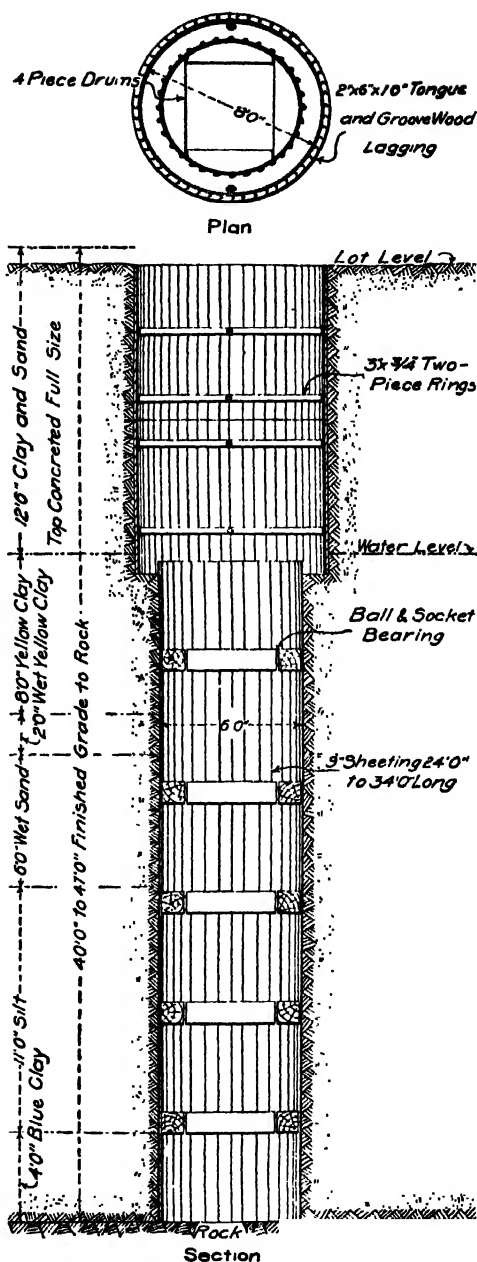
Open Well for Railway Exchange Building, St. Louis.
